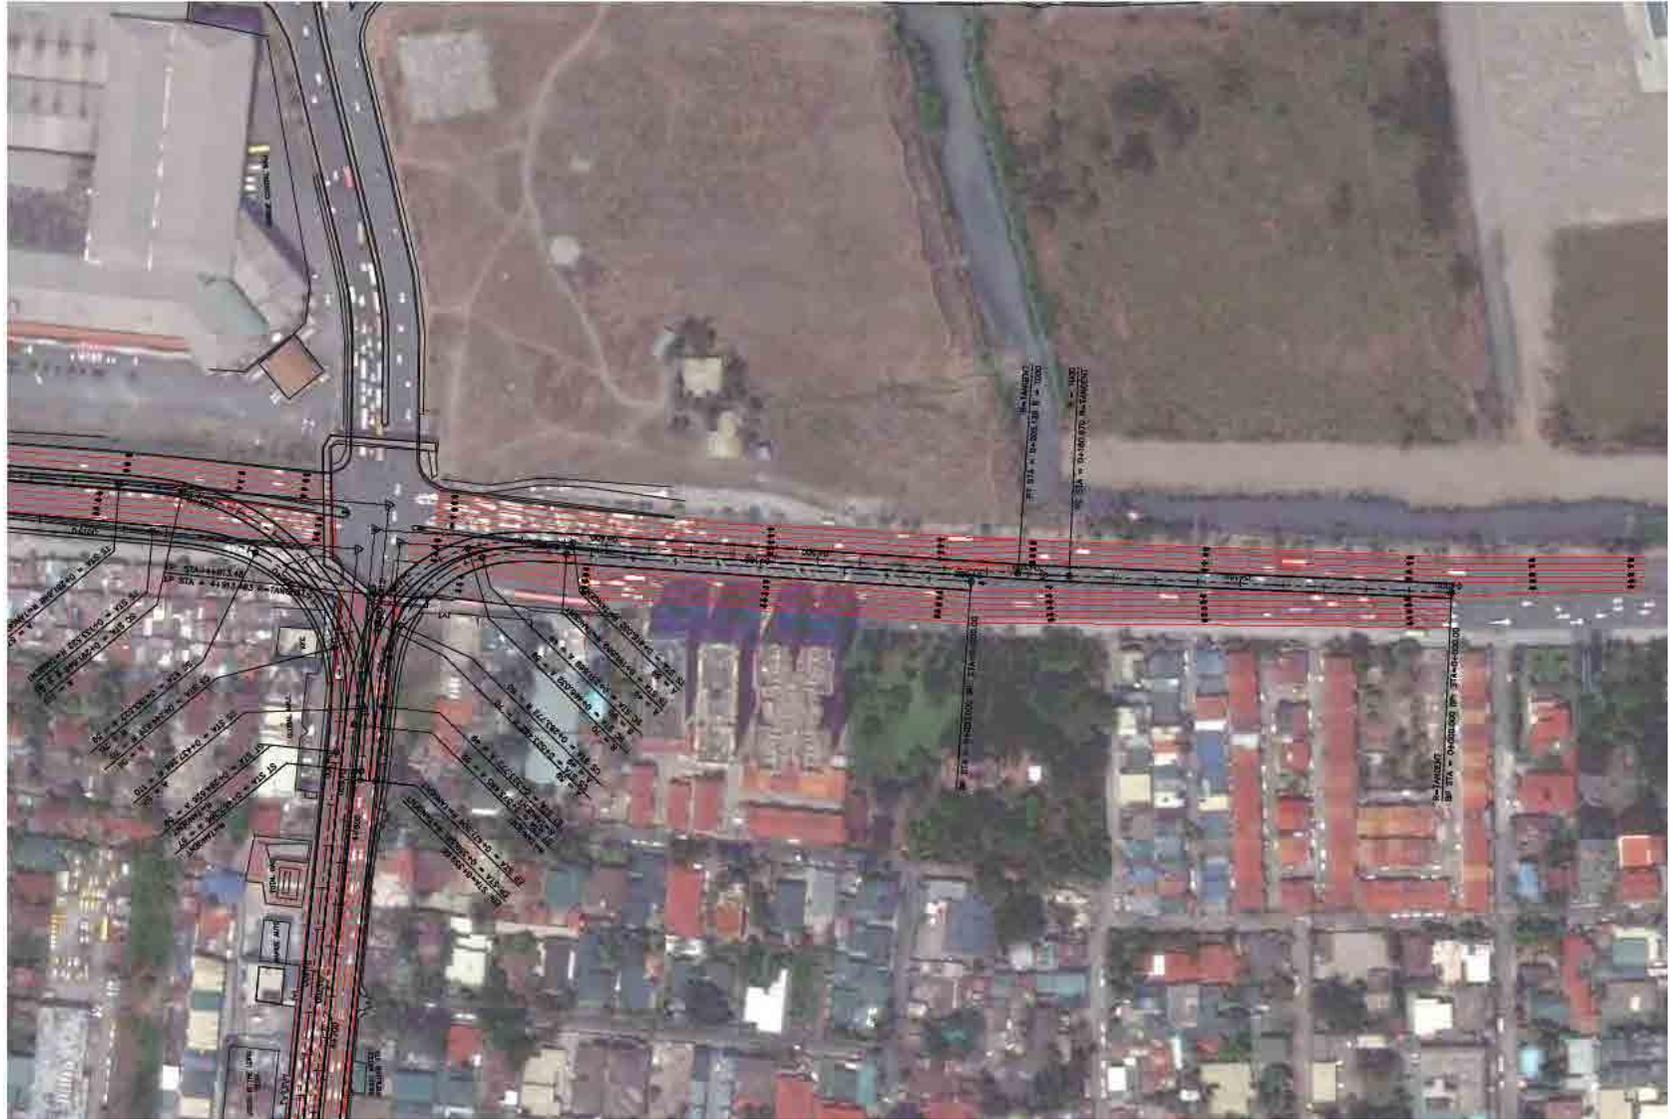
AT-GRADE ROAD PLAN (ROXAS BOULEVARD-2)
